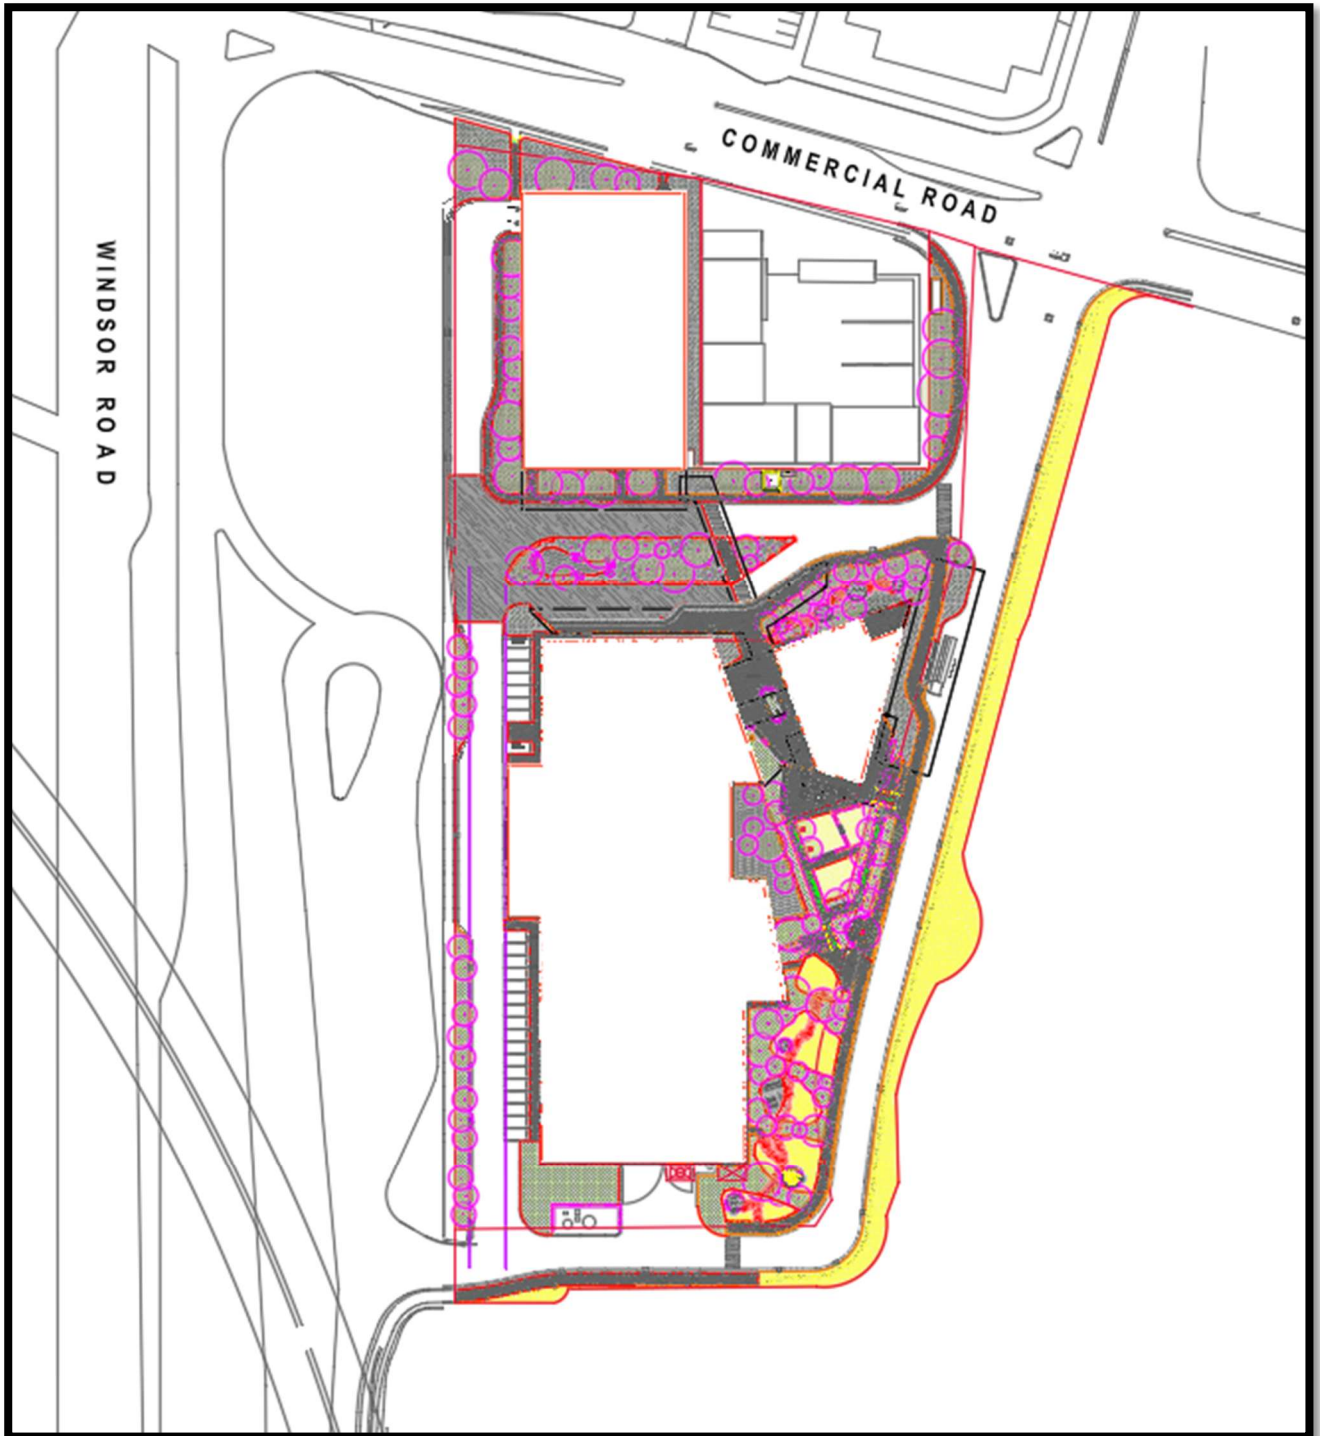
SSDA Bulk Earthworks Plan extract showing the extent of proposed bulk earthworks
